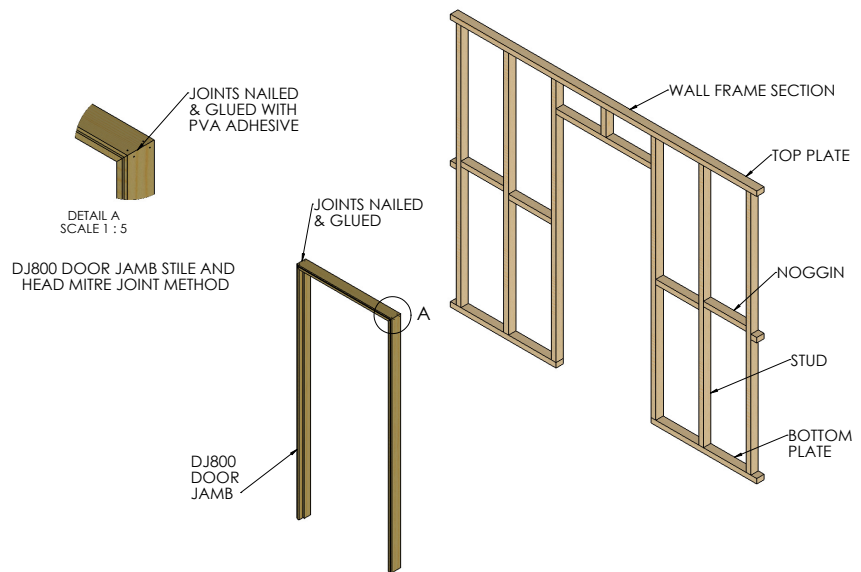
DOOR JAMB ASSEMBLY DETAILS
